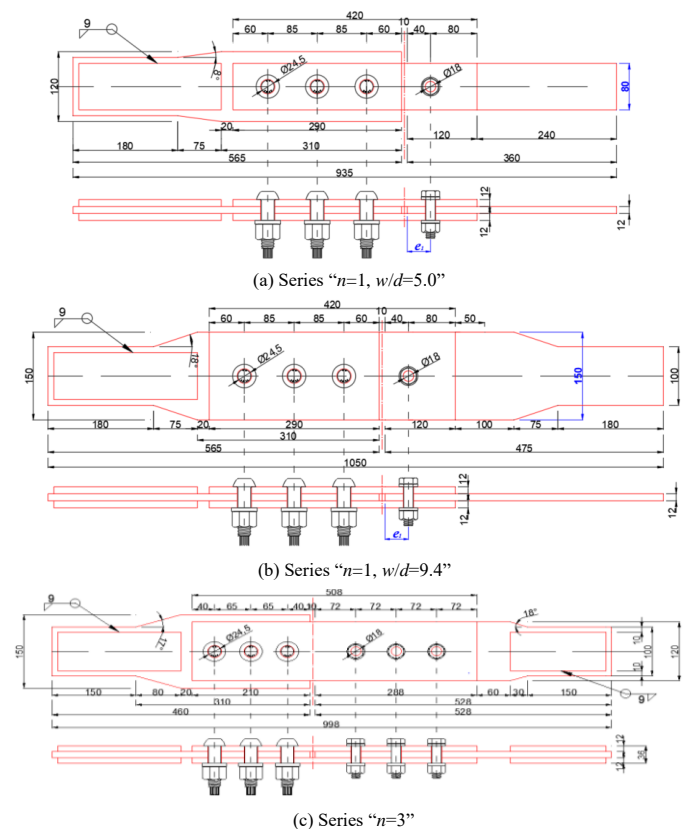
Geometrical dimensions of specimens (unit: mm)
